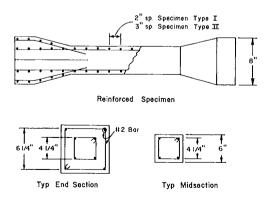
REINFORCED CONCRETE SPECIMENS
